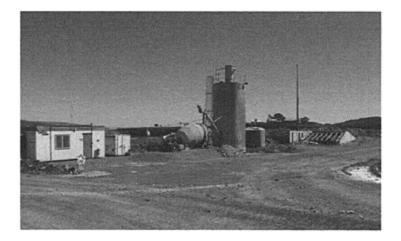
Surface facilities showing slurry plant and grizzly above waste pass.
